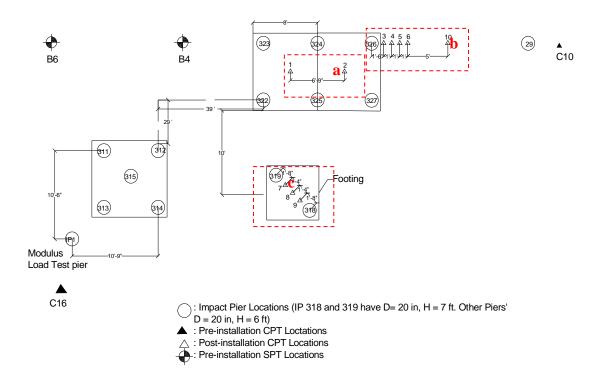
Lynn Haven, FL: Pier and CPT locations plan layout
